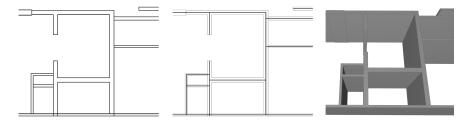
Walls on plan (left), paired walls and reference lines (center) and generated walls (right).
